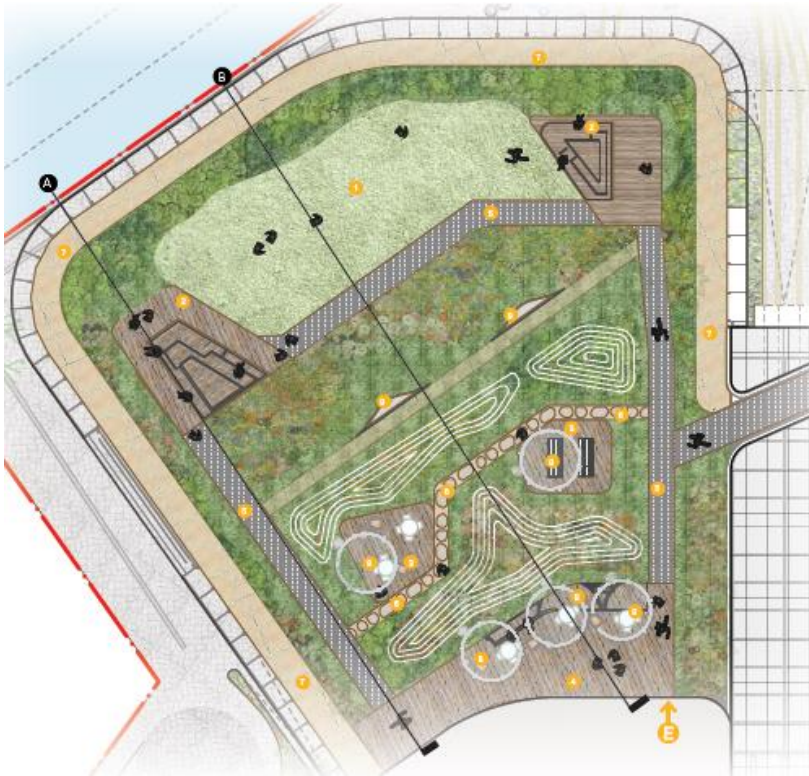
Proposed landscape plan of rooftop terrace on Building F
